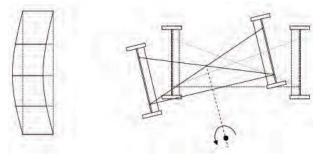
BUCKLING OF PAIRED BEAMS PRIOR TO CONCRETE HARDENING
